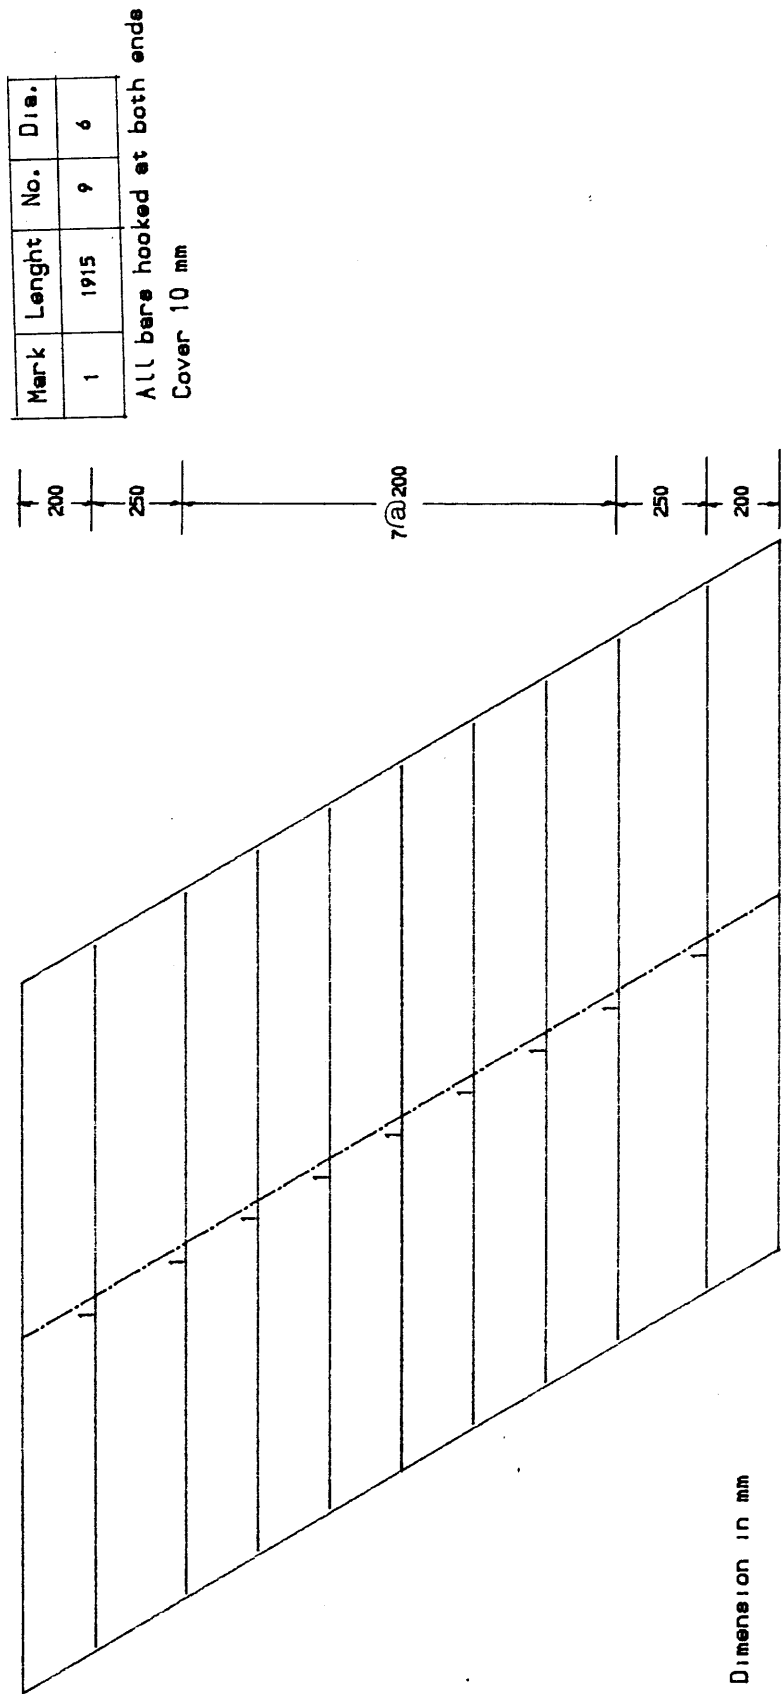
MODEL SKEW SLAB NO. (1) Details of top transverse steel parallel to the supported edge.
